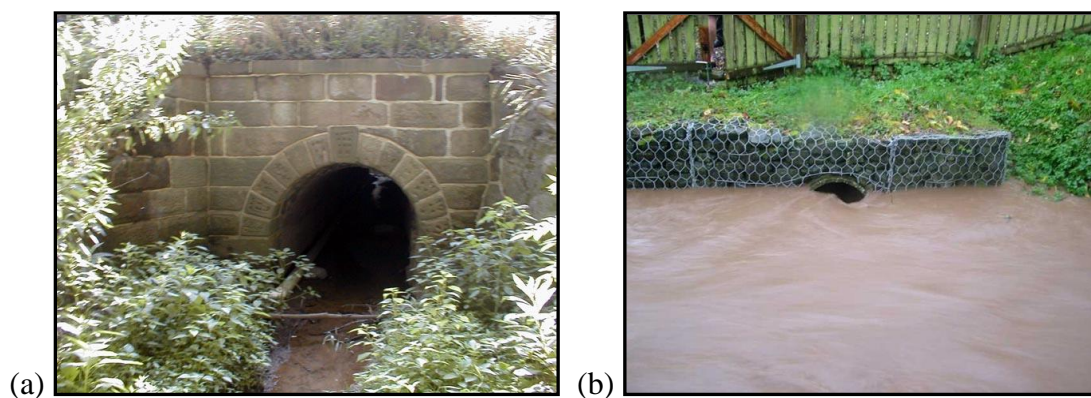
Culvert inlet with (a) brick and (b) Gabion head walls
